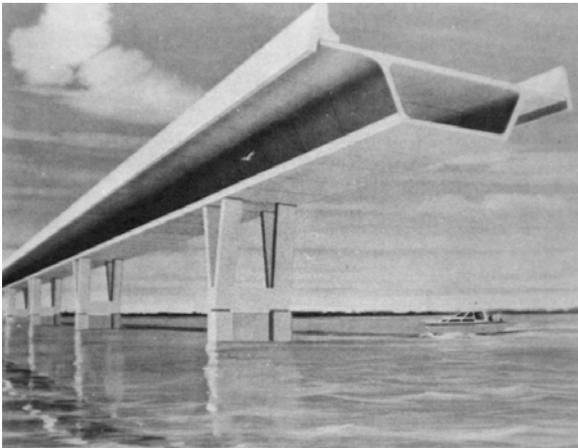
General view of Long Key Bridge, Florida, USA. 3.7 km total length with 36 m spans. Muller and Figg, 1976. (Podolny and Muller)
